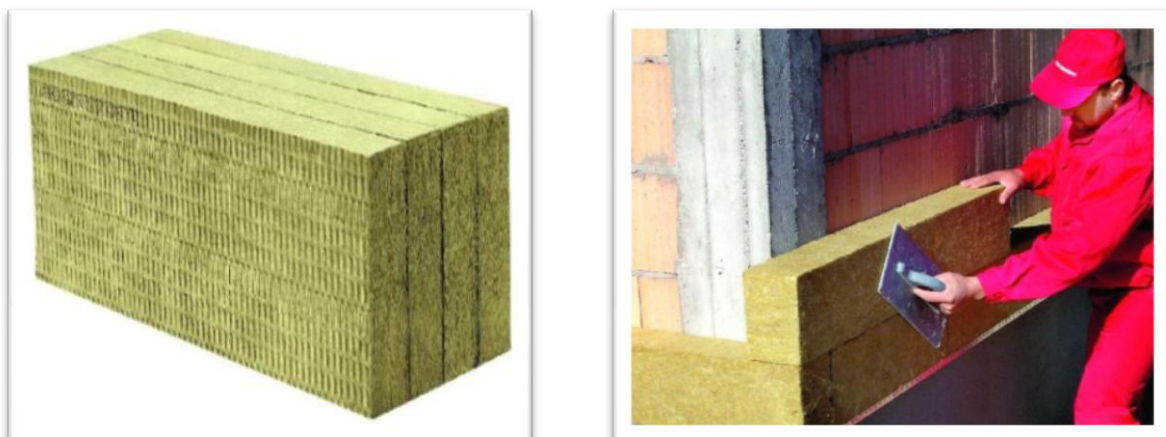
Stones wool and its installation on the wall (Rockwool)
